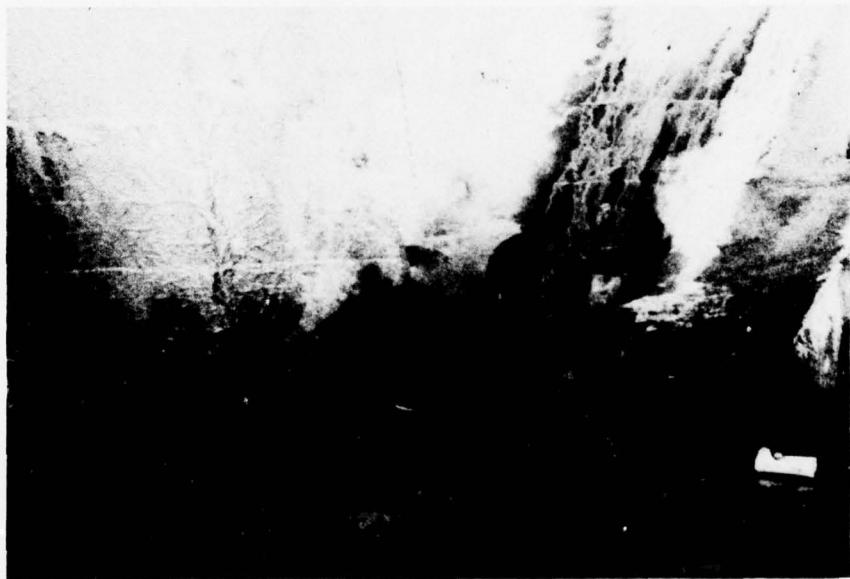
SEEPAGE NEAR UPSTREAM JUNCTION OF SPILLWAY SECTION AND BASE SLAB (LEFT COMPARTMENT)
